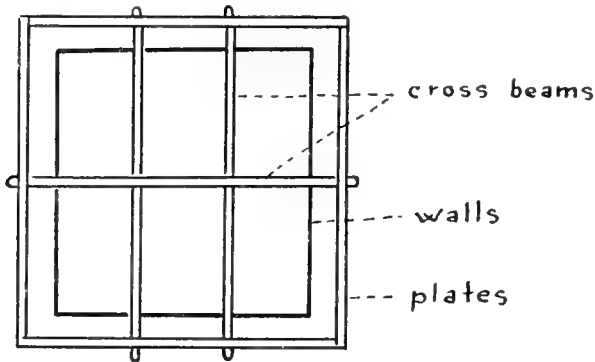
Plan of ceiling in an elaborate kitchen (*trója kosína*).
